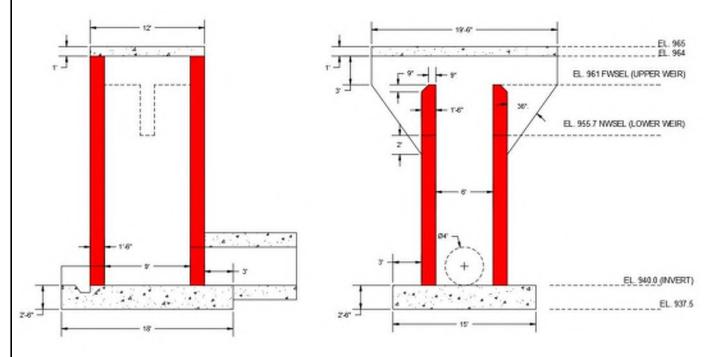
Section Cross Section and Plan View (Vertical Walls in Red)
